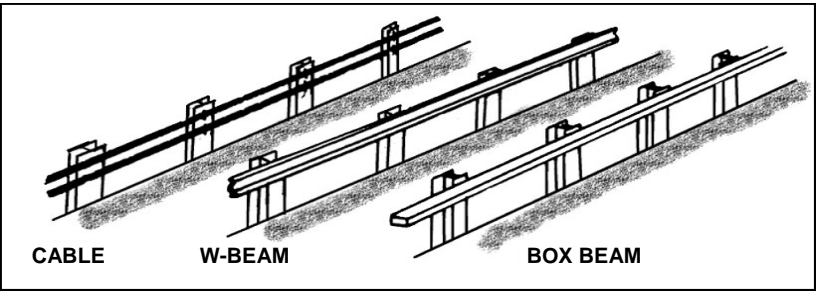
Typical Guardrail Construction (From MIL-HDBK-1013/14)
